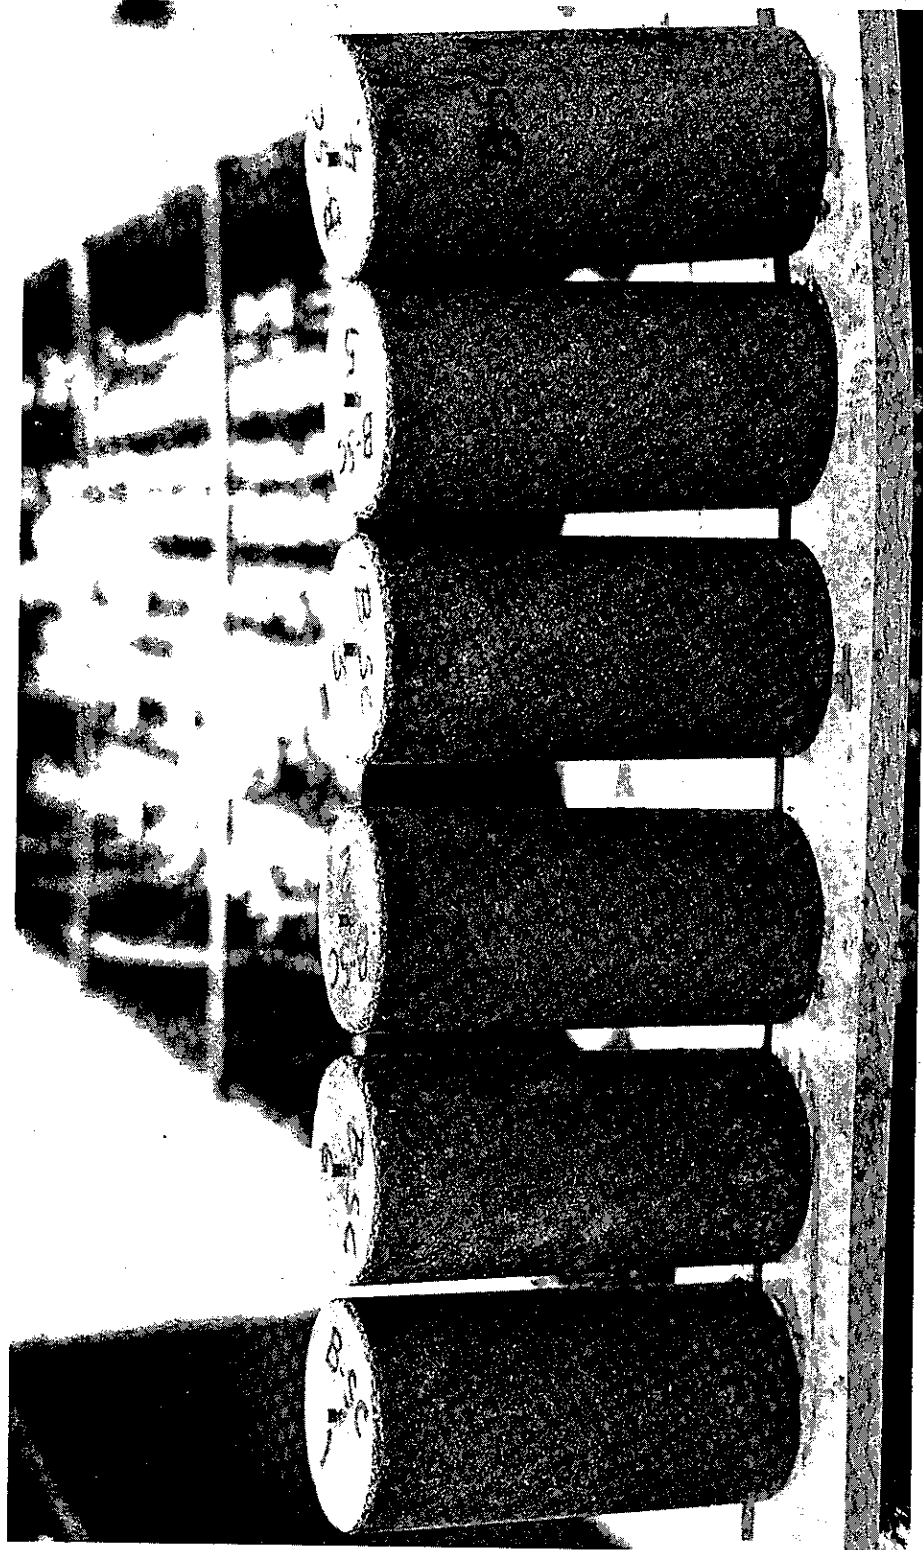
4-1/2-sack concrete after four cycles of alternate immersion in sodium chloride and oven drying
